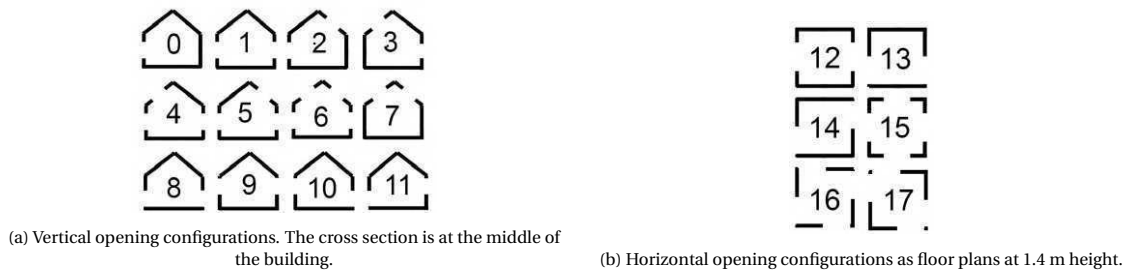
Opening configurations studied as cross sections on the right and floor plans on the left.
